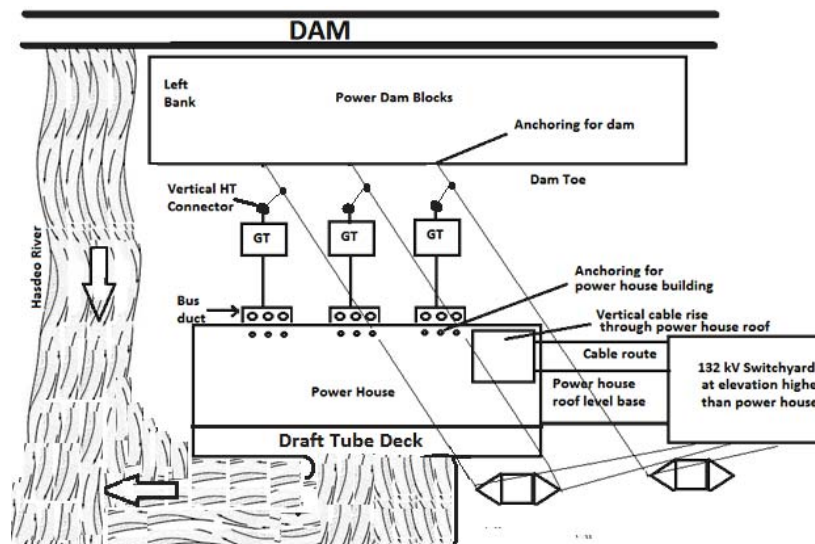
Relative positions of power house building, G.T., and Switch yard of Hasdeo Bango HPP
